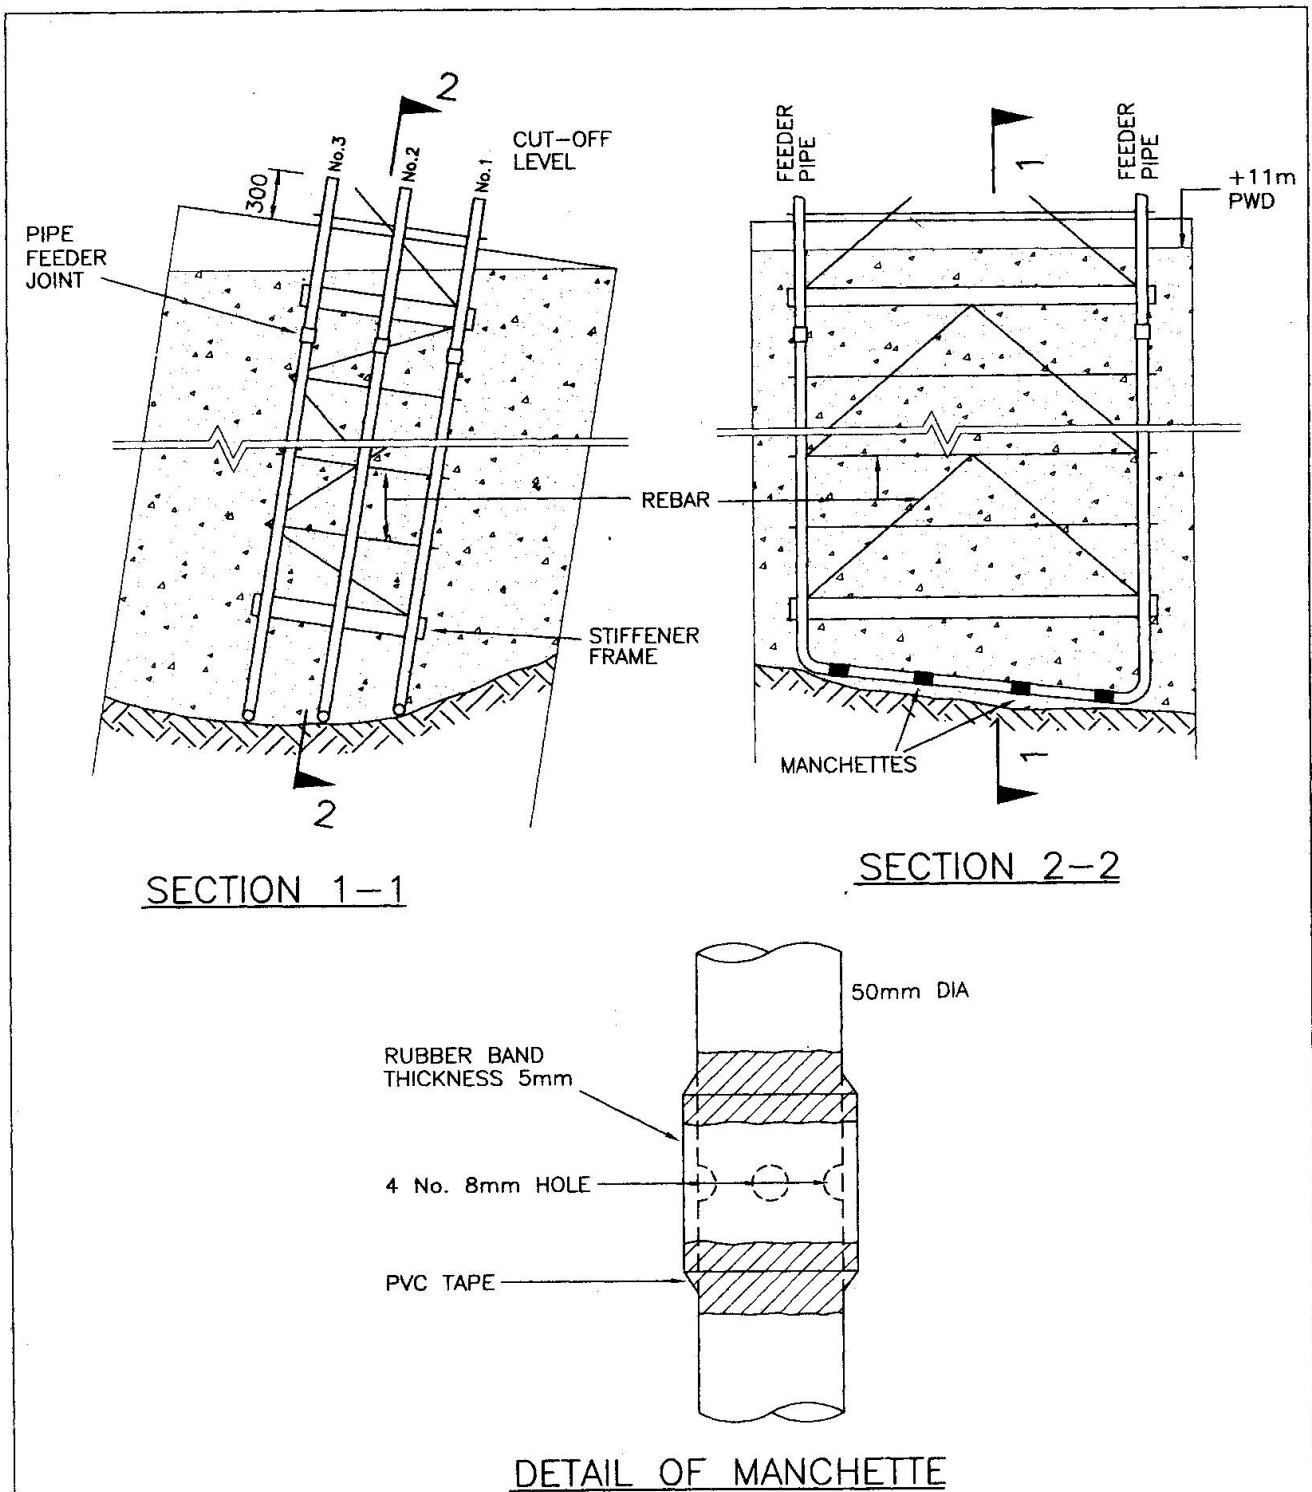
Pressure Grouting using Tube-a-Manchette Technique
